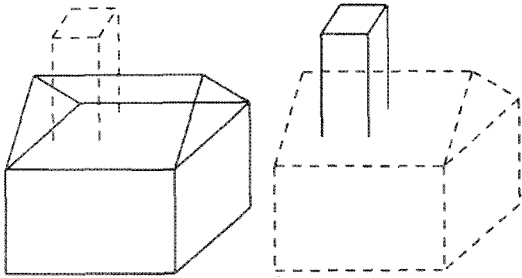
Roof types of parts of a building (left : gable, right : flat).
